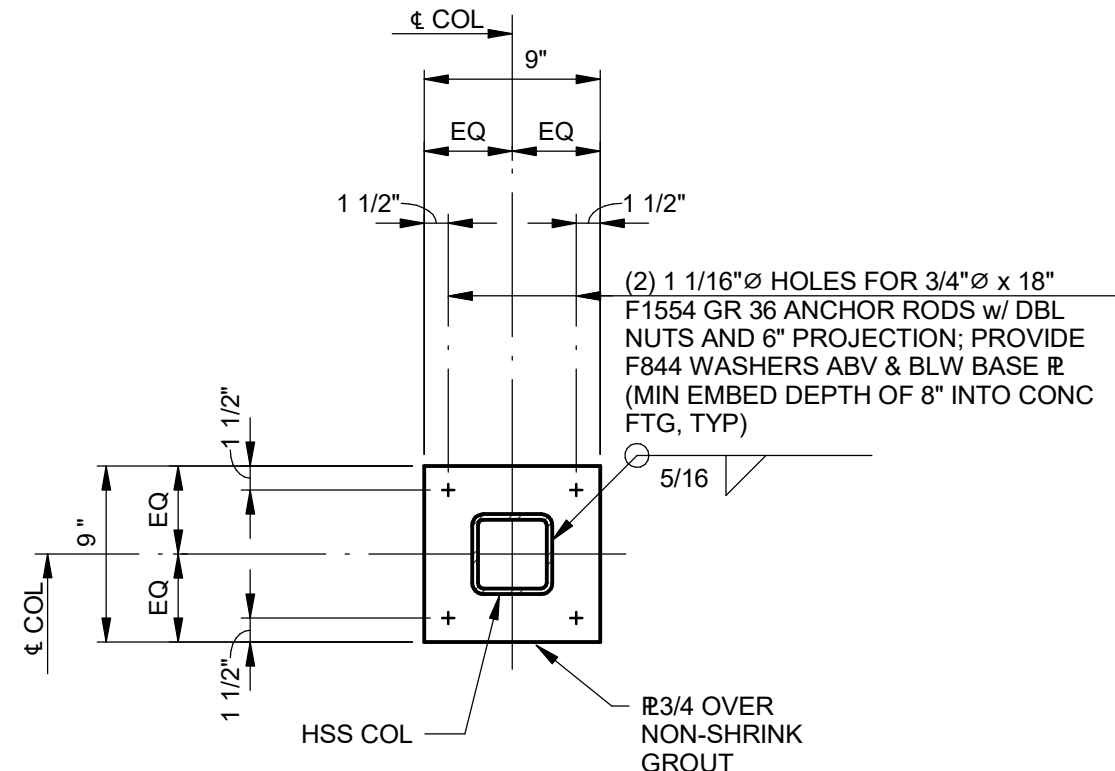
HSS COLUMN AT END OF CMU WALL
